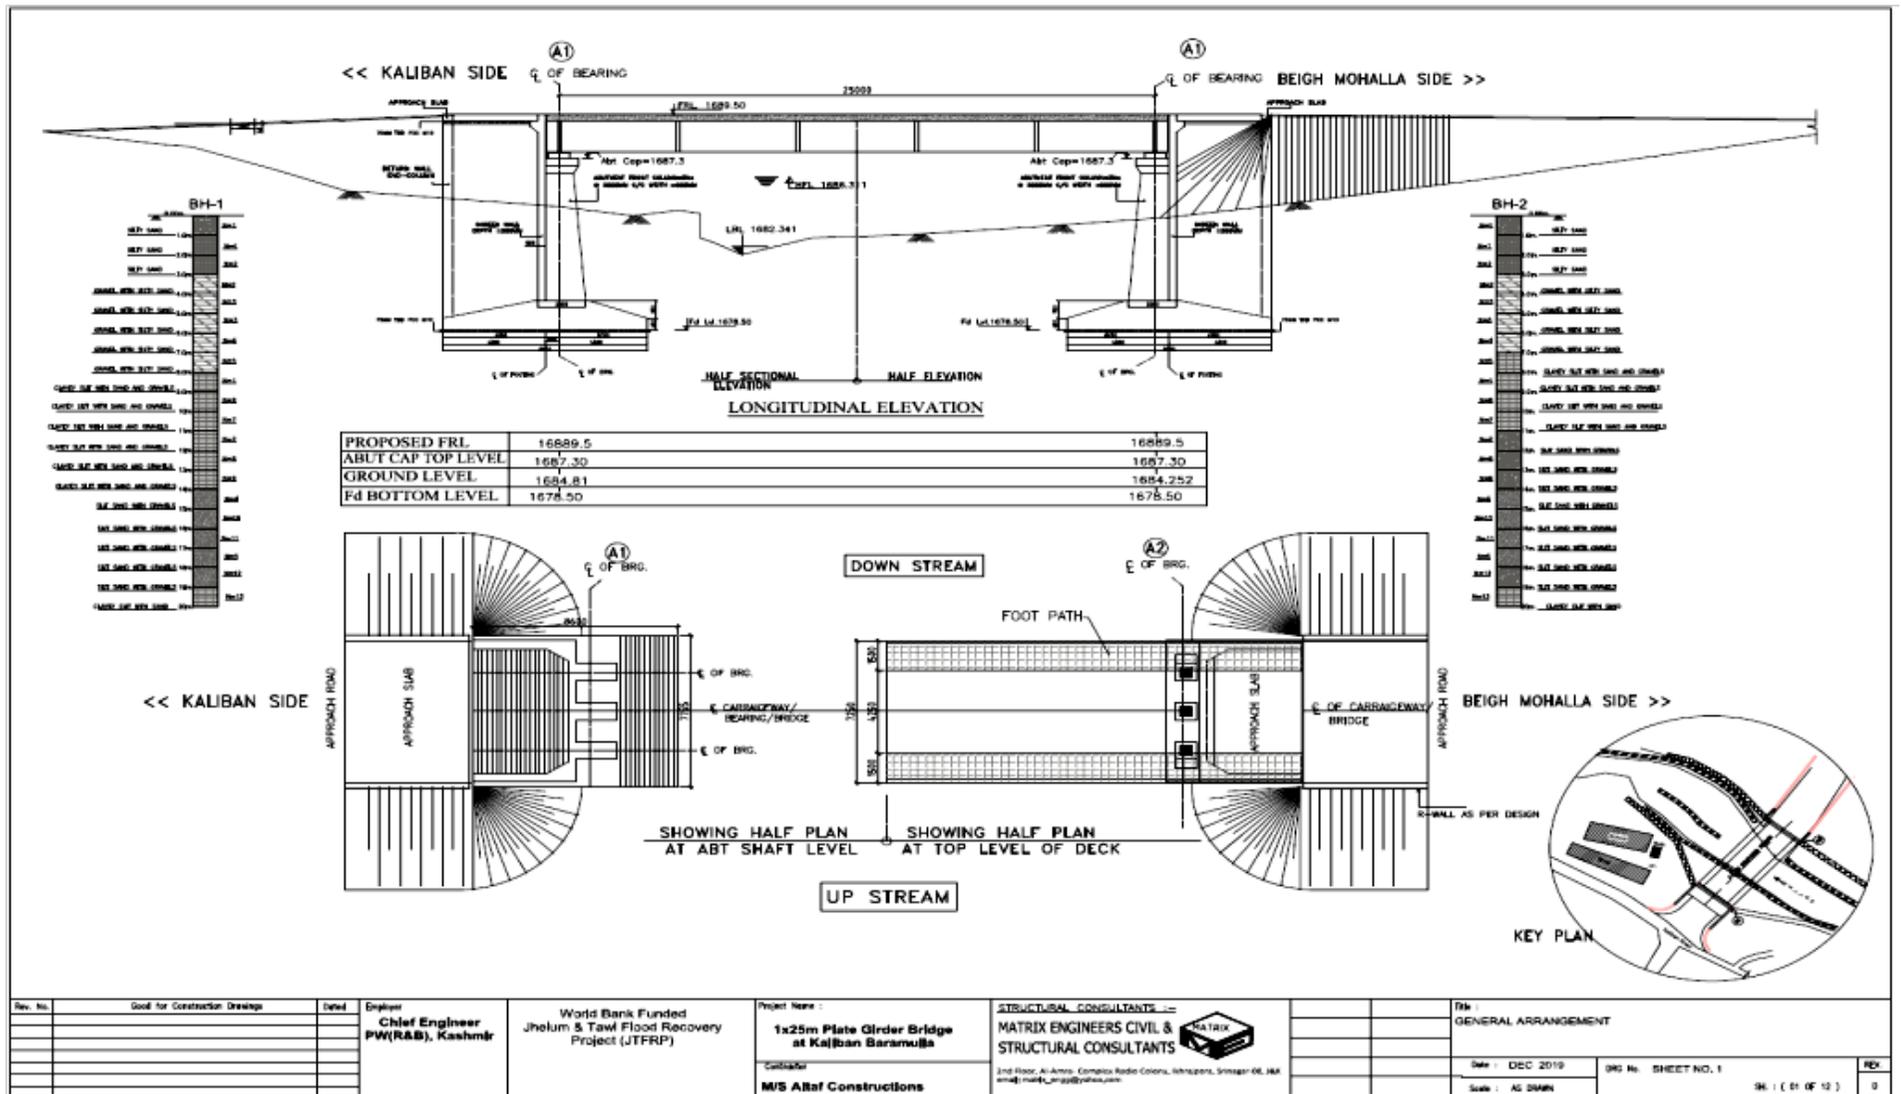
General Arrangement Drawing (GAD) of the Proposed Construction 1x25 meter Plate Girder Bridge over Raine Nallah at Kaliban in District Baramulla
